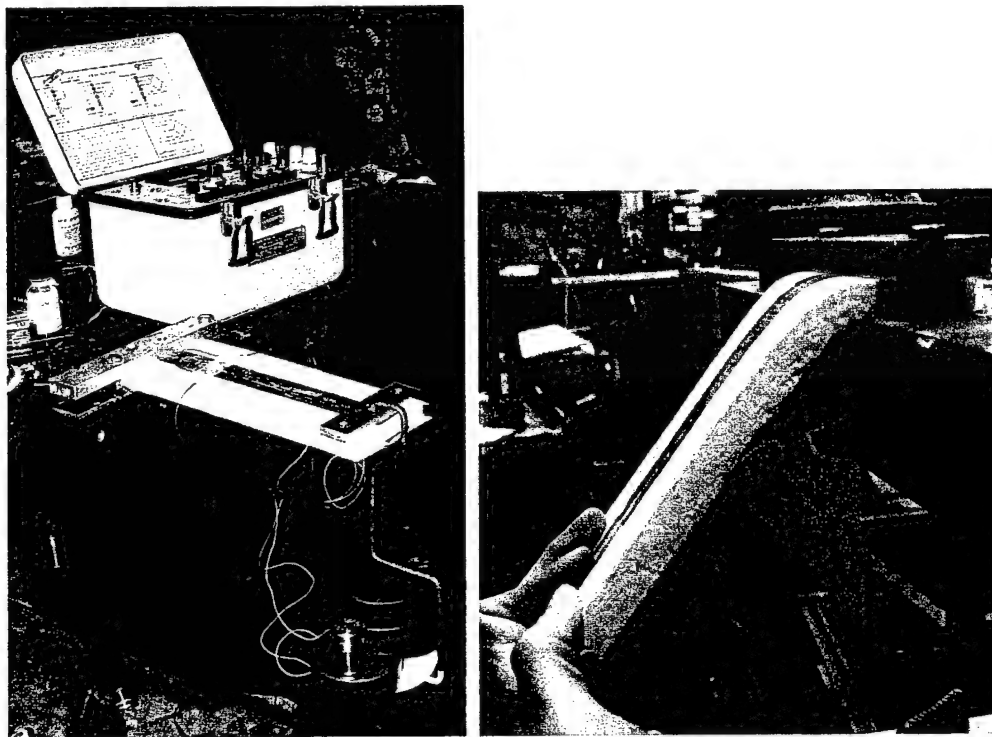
Instrumented Test Panel Undergoing Destructive Testing (Tests 1 and 2)
